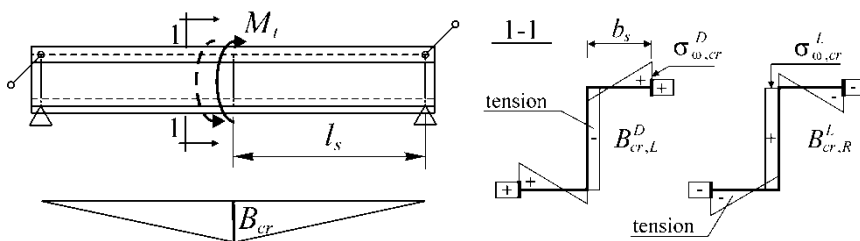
Thin-walled bar with Z-section made from walls (plates) of I and III type
